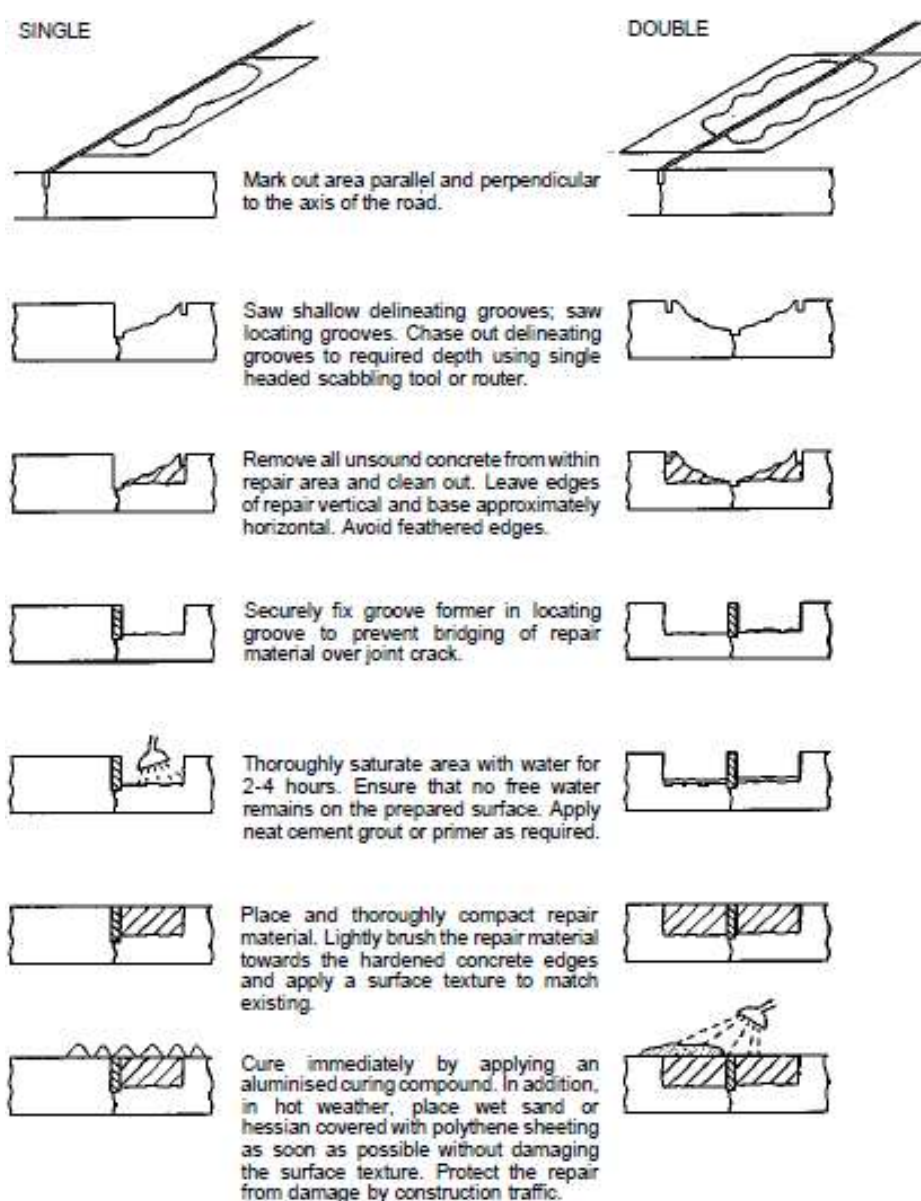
/14- 1 Procedure for thin bonded aris repairs to shallow spalling at joints (taken from Figure 8.2 of Concrete Pavement Maintenance Manual, 2001)
